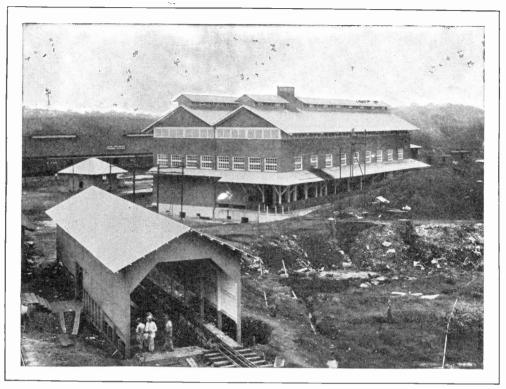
ELECTRIC POWER HOUSE OF THE GATUN CONSTRUCTION PLANT
